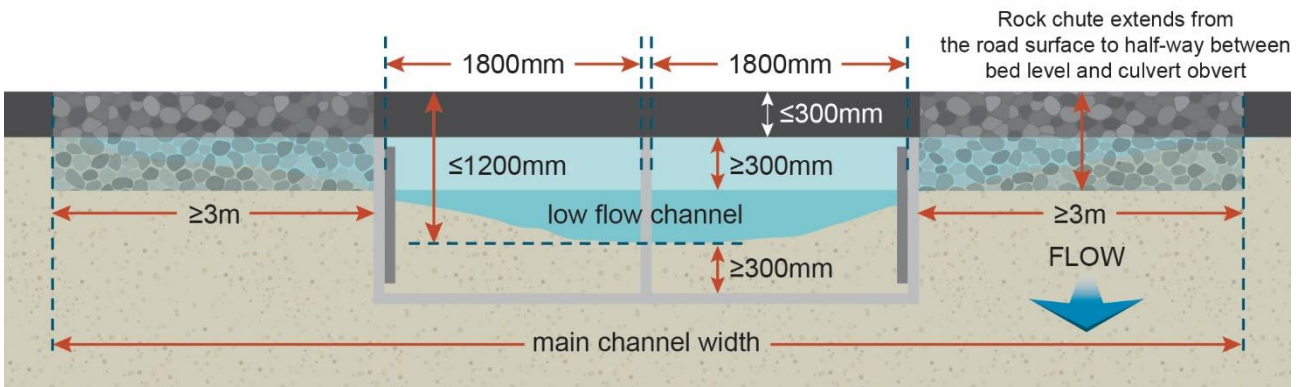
Culvert crossing option 3 (cross-section of waterway) – red waterway
